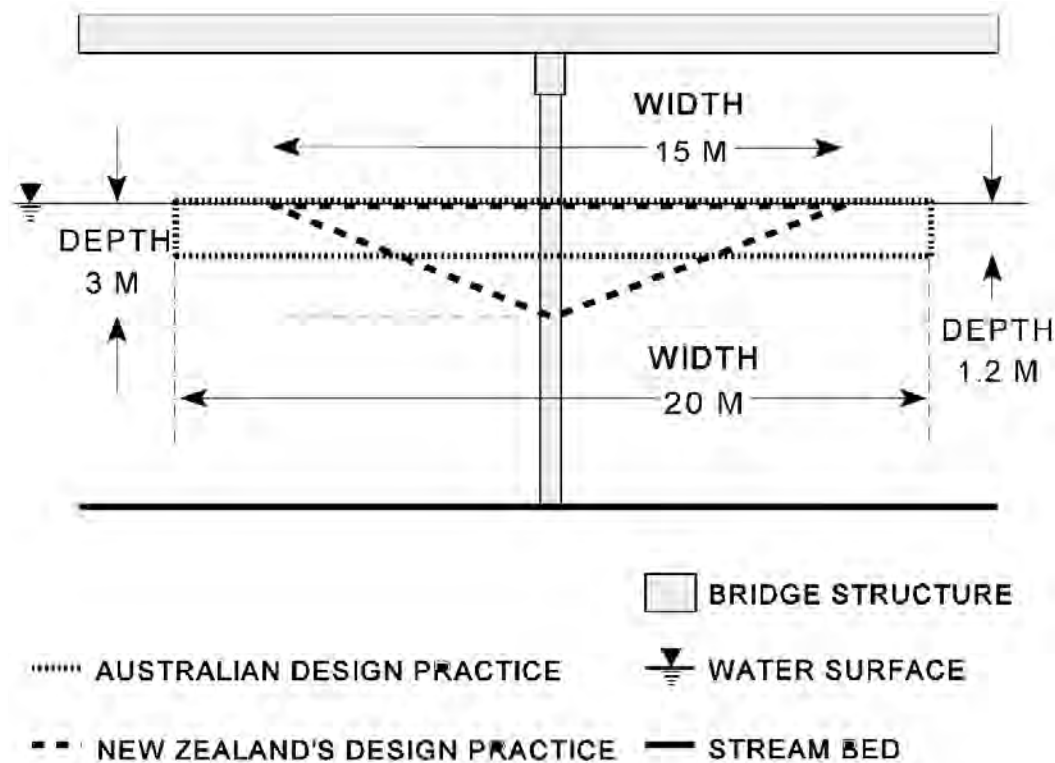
Vertical cross sections of assumed maximum drift accumulations on single piers.
